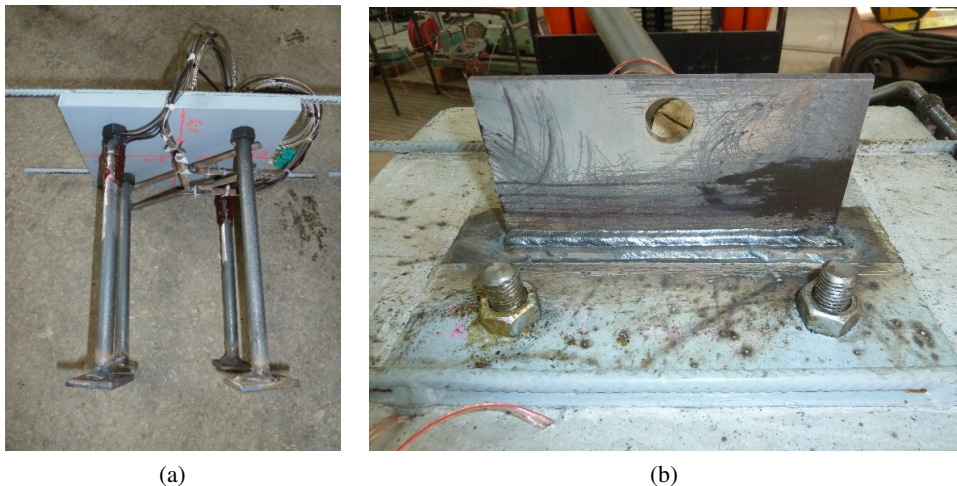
Tested elements before and after the laboratory tests; (a) Tested element with sensors, (b) Anchor plate with a welded connecting element
